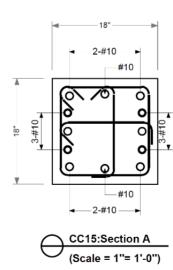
Column 33 & 34 (Longitudinal Rebar)
